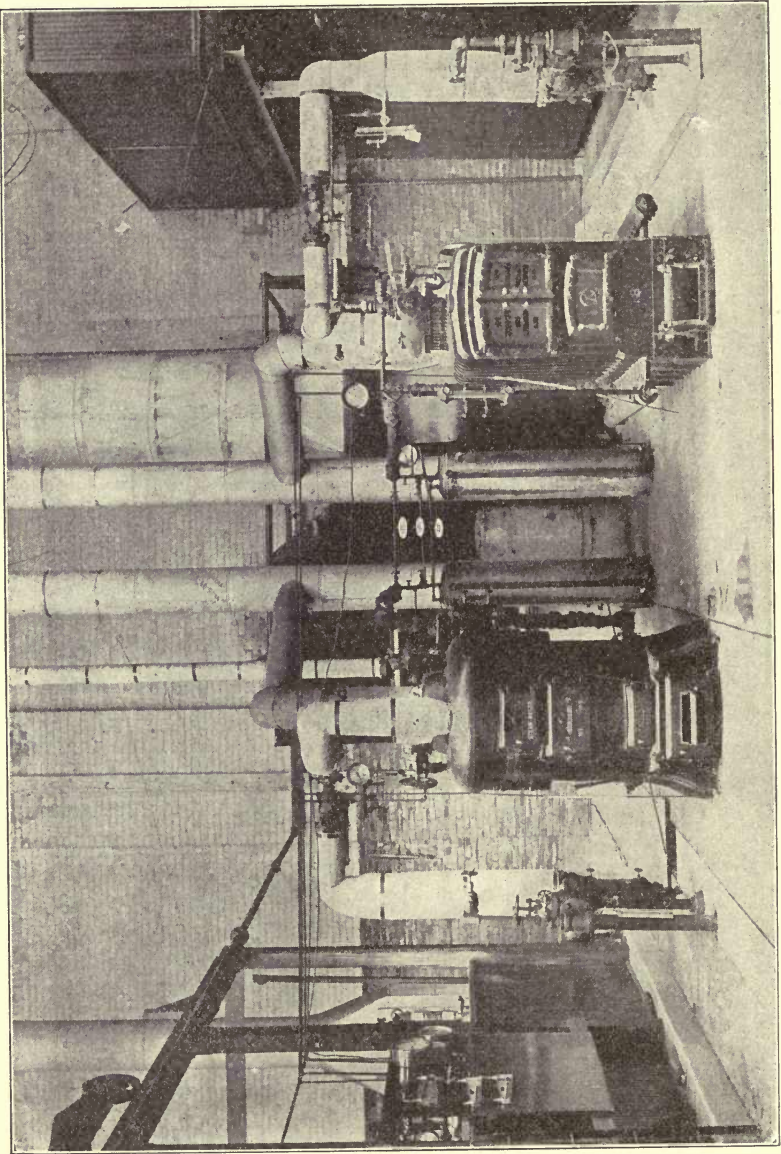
GENERAL ARRANGEMENT OF PLANT
